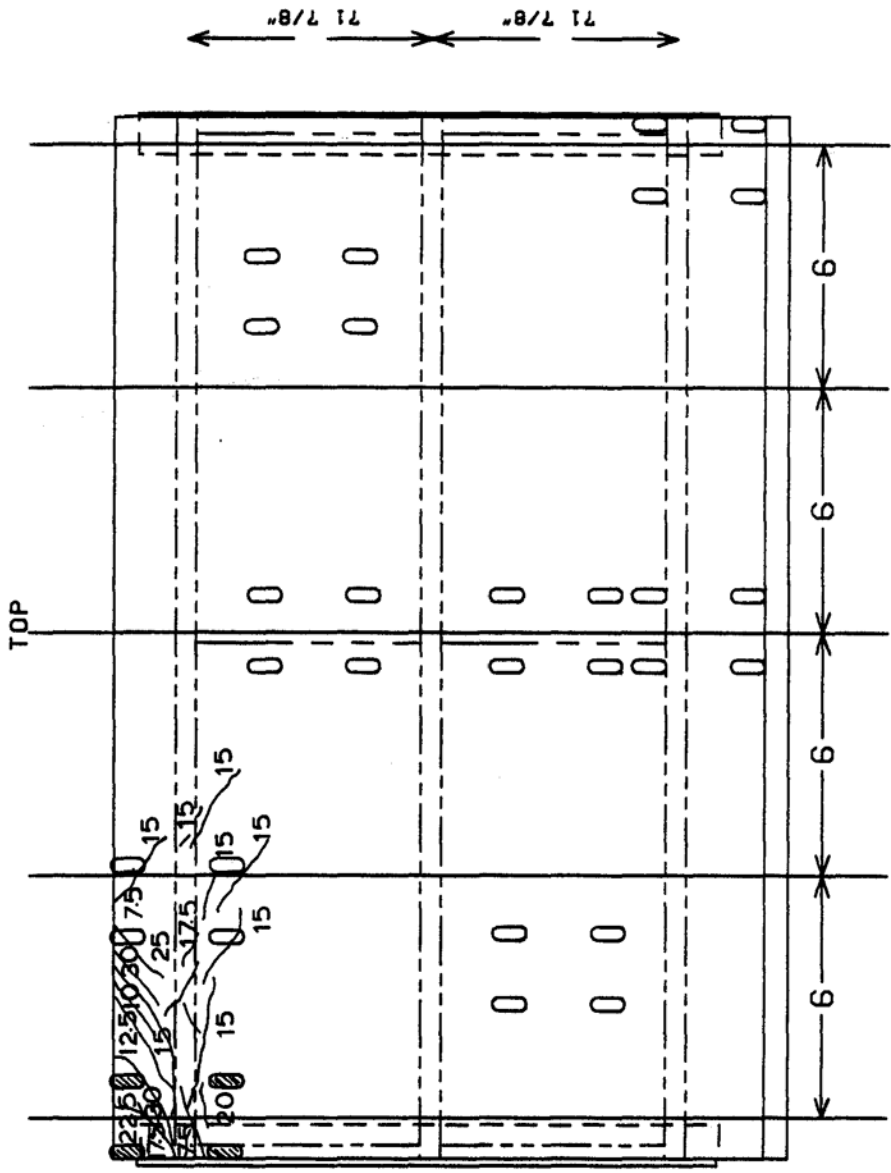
Top Cracking Pattern (Third Bridge - Test No. 6)
